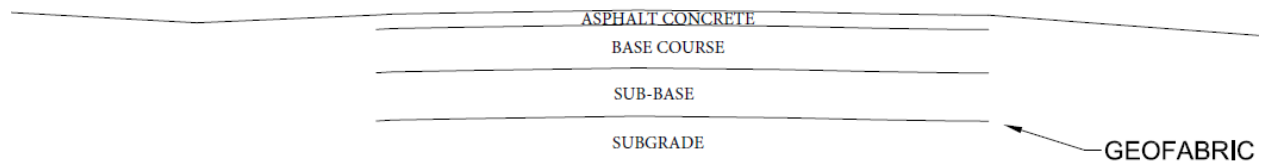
The as-built cross section of the test section FWD4-3. Horizontal scale is equal to vertical scale.
